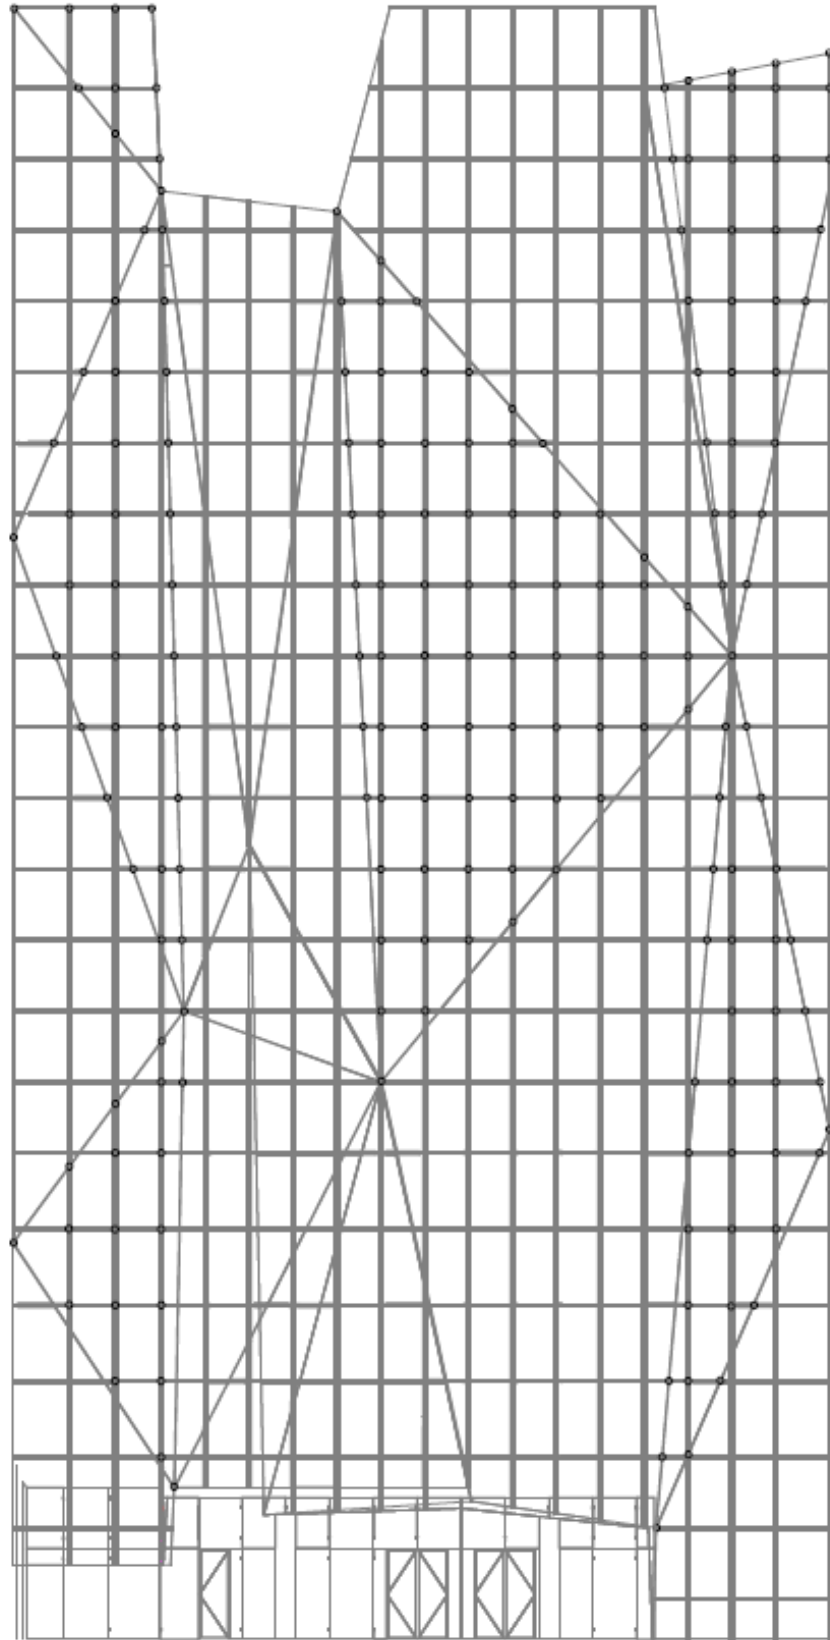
BUILDING ELEVATION - LOCATIONS FOR FIXTURE TYPE F29
